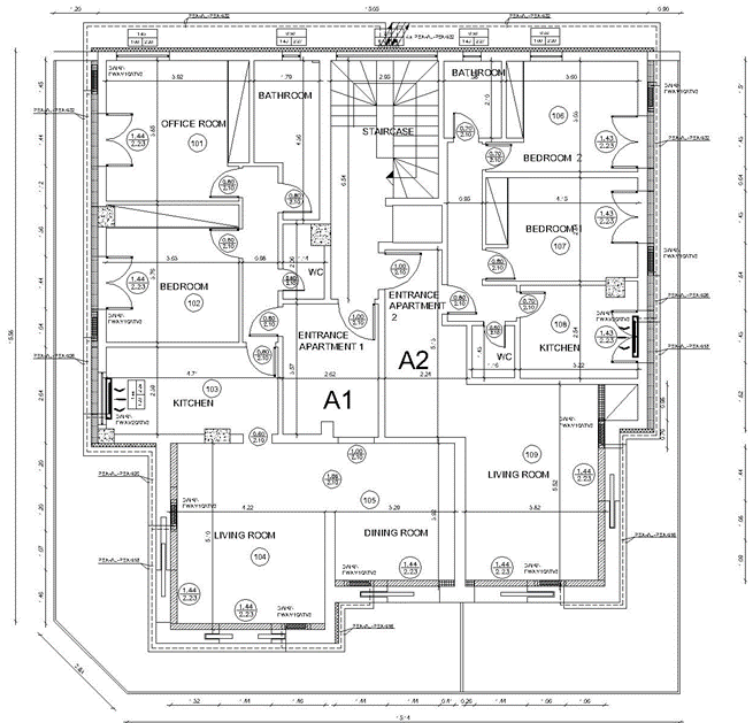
FLOOR PLAN OF THE TWO APARTMENTS & NAMES OF EACH SPACE – ROOM
